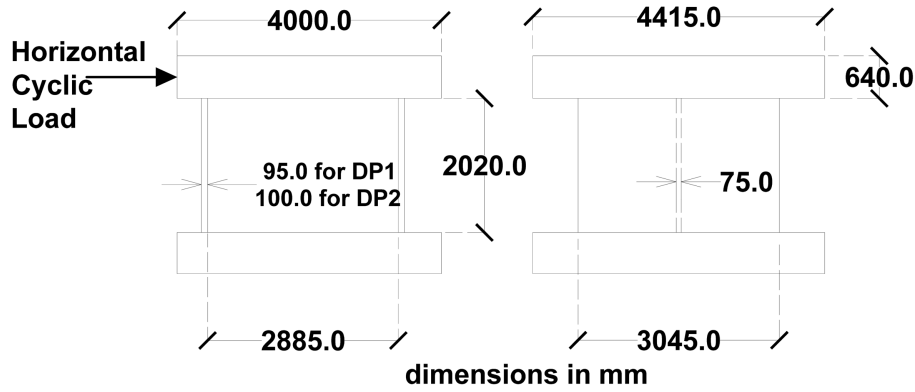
Details of DP series specimens (Palermo and Vecchio 2002)
